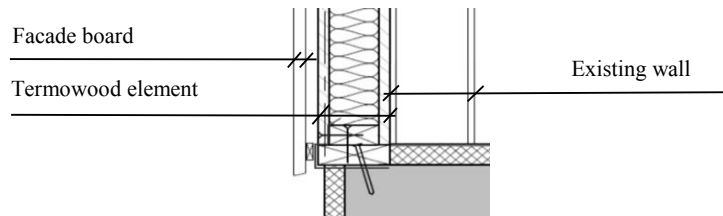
Wall section of renovation with Termowood elements and facade boards.
